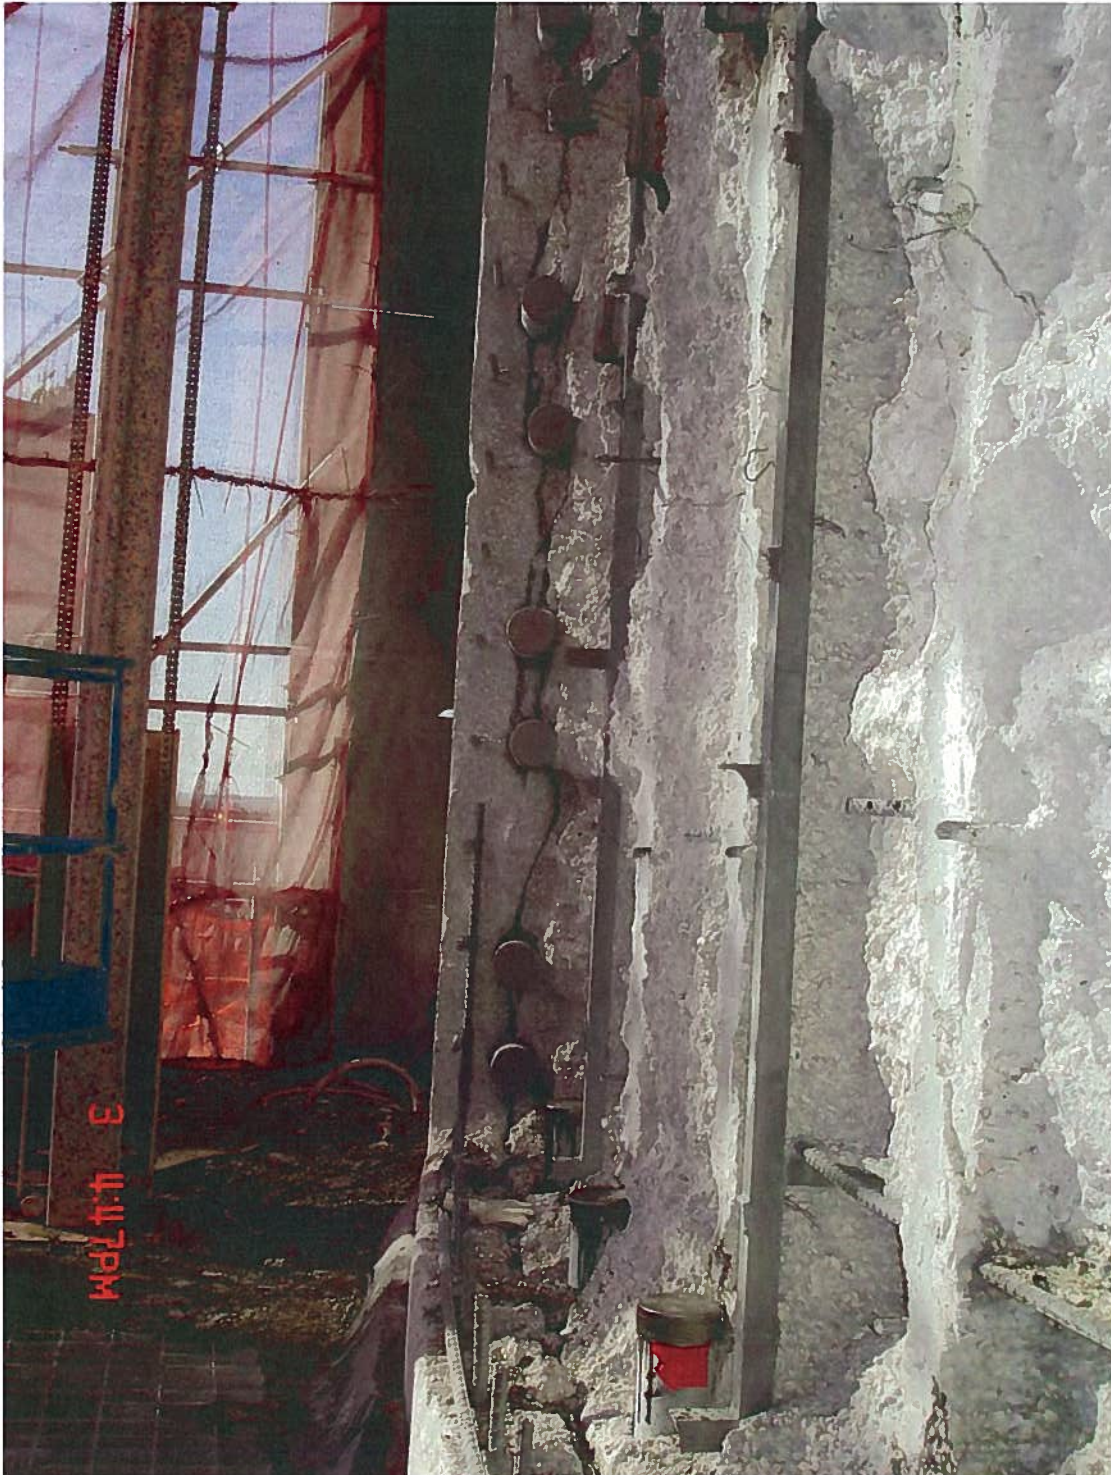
Photograph of delamination crack running from horizontal tendon to horizontal tendon, parallel to the wall surface, approximately 10 inches deep. (Photo taken after partial concrete demolition)
